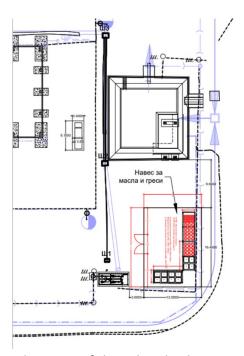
Plan view of the Oil and Lubricant Storage Shed
